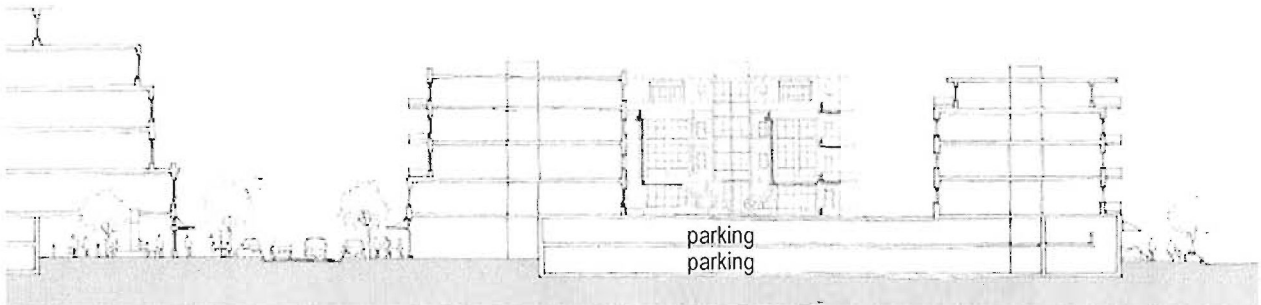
d.2. Structured parking within the building is the preferred location for parking on a site
